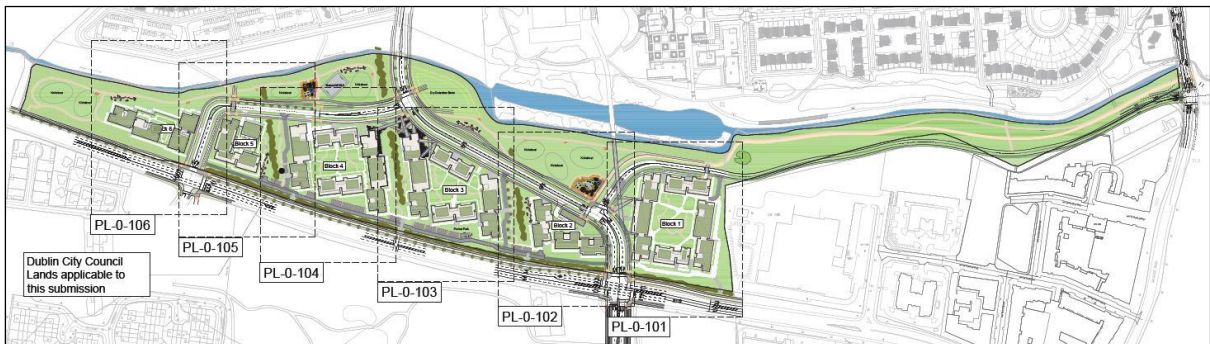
DCC Lands Site Plan as submitted at Stage 2 Pre-Planning
